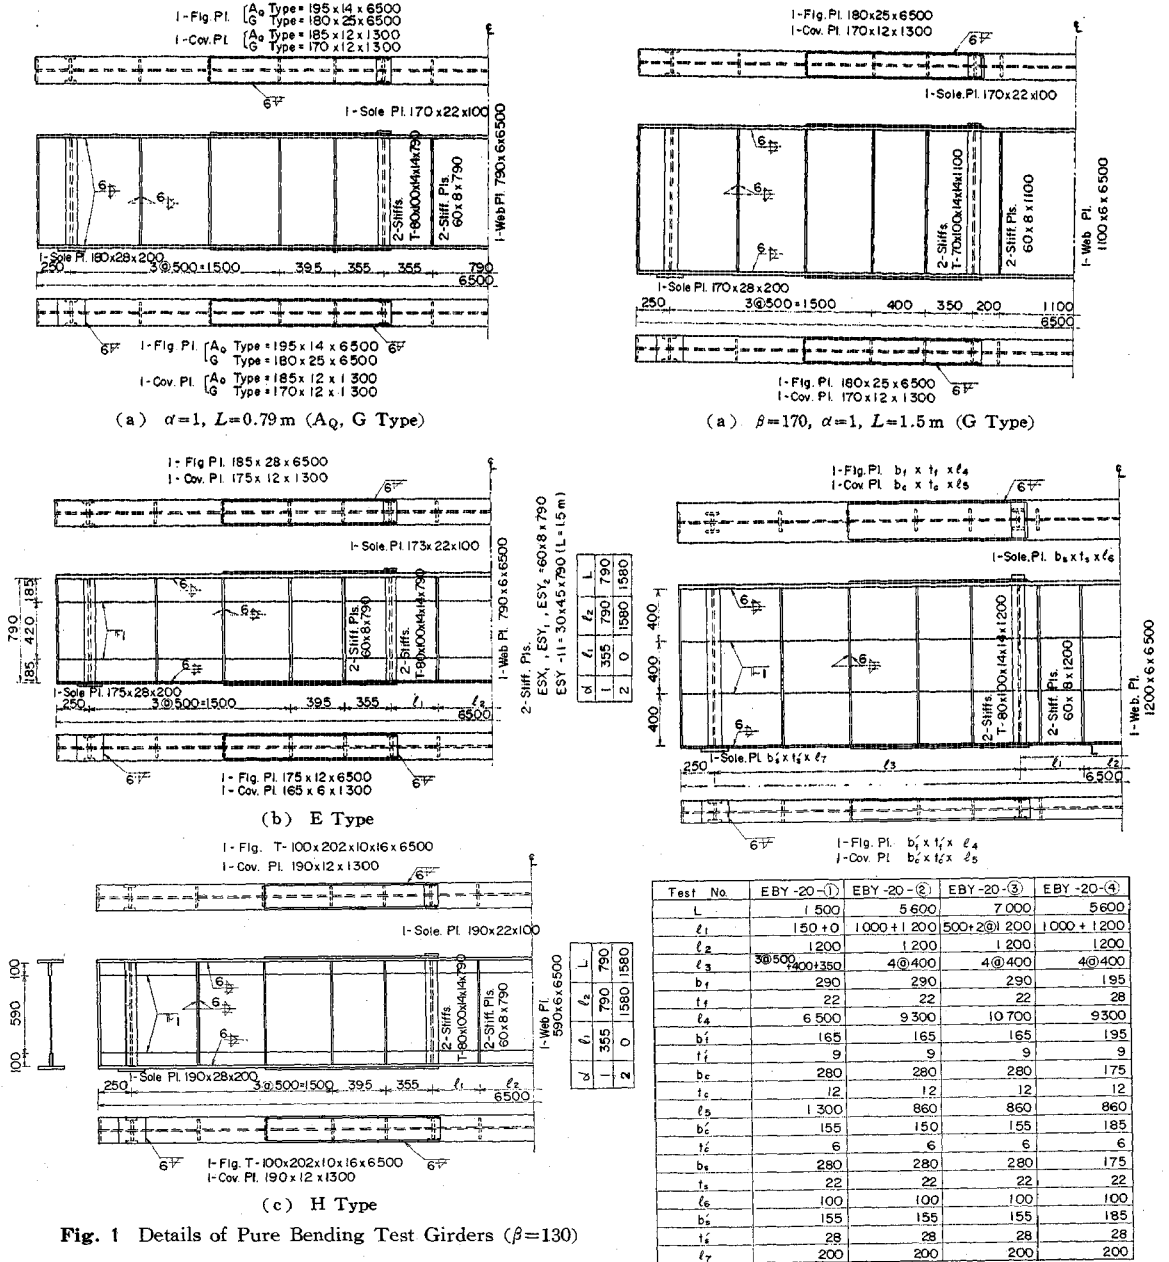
Details of Pure Bending Test Girders ($\beta=130$)
